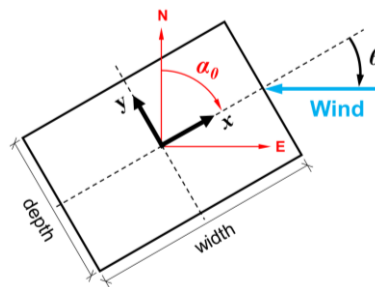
Plan view of the building showing orientation angle and wind direction.
